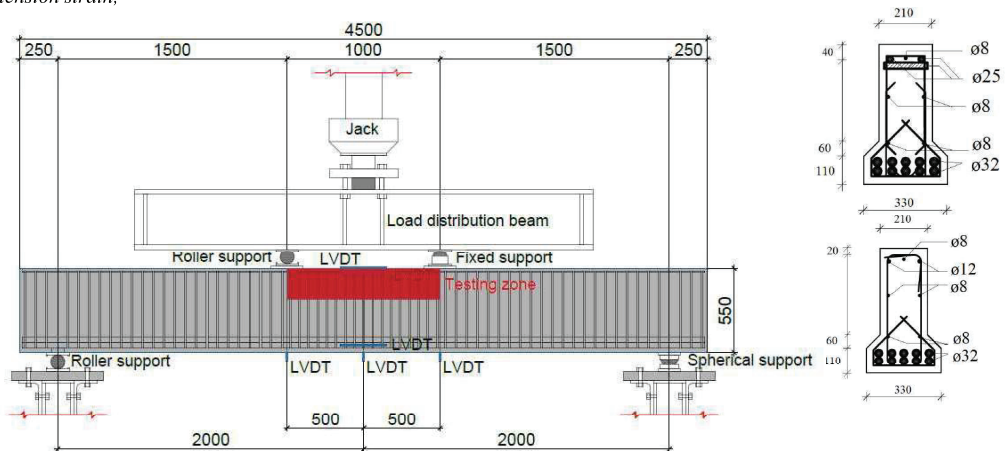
Detailed test setup of beams and cross sections with the reinforcement layout
